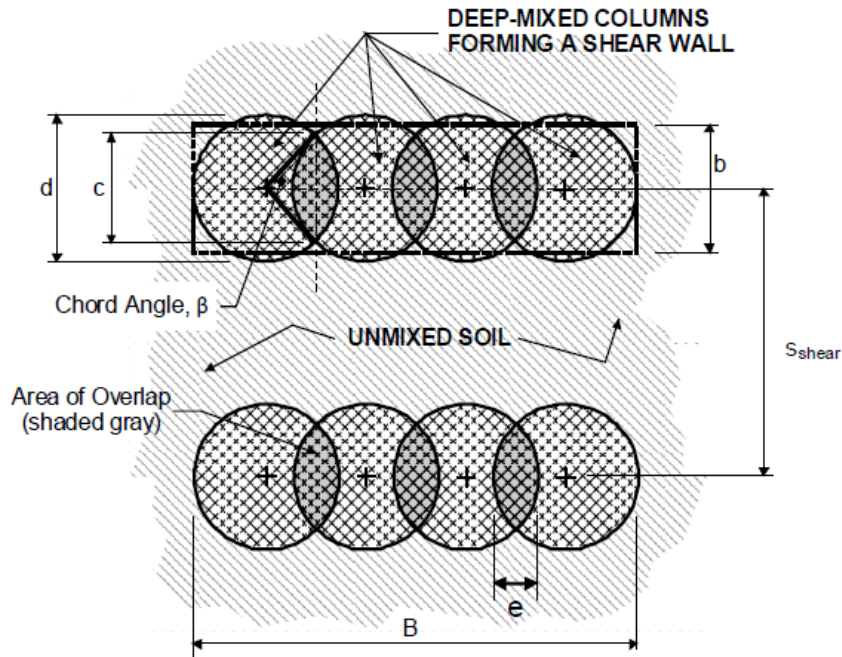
Definition Sketch for Soil-Cement Column Dimensions (FHWA, 2013)
